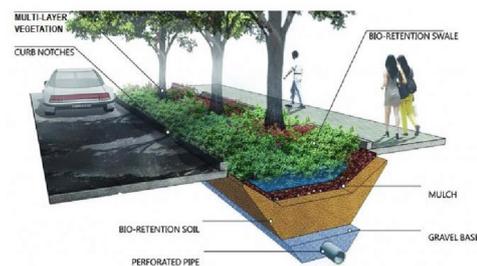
Schematic diagram of a bio swale near a sidewalk
